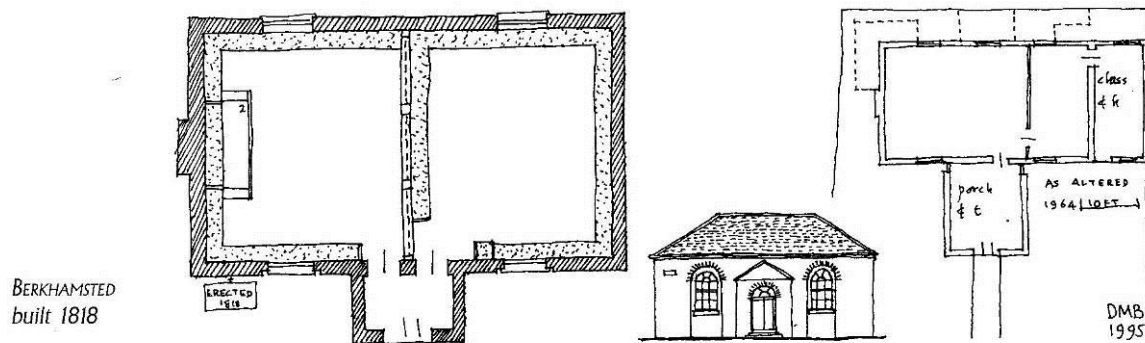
The original plan (left) and elevation, with the plan as altered in 1964 (right) *Butler 1999 p.253* (north is to the bottom).
